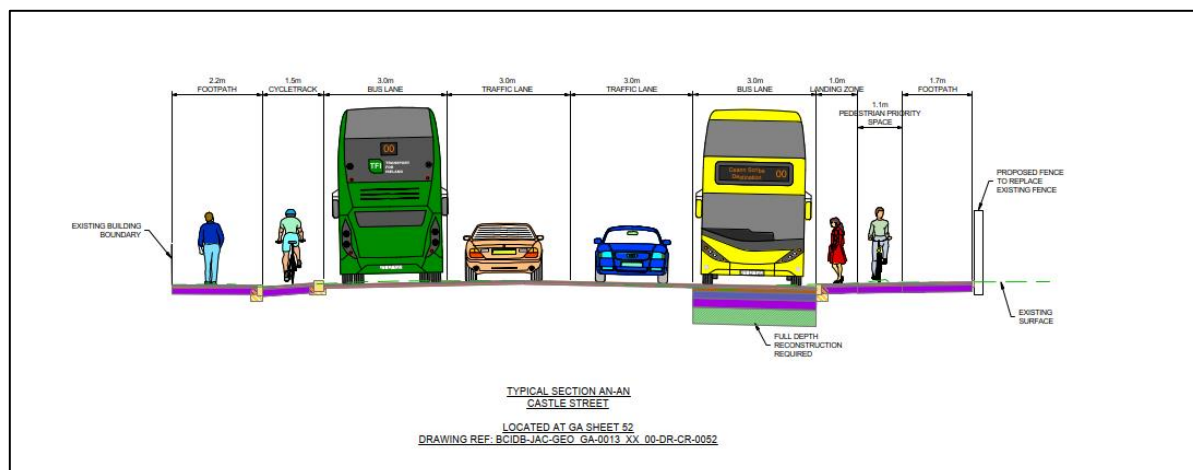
Extract from Typical Cross-section Drawing (Sheet 22)
